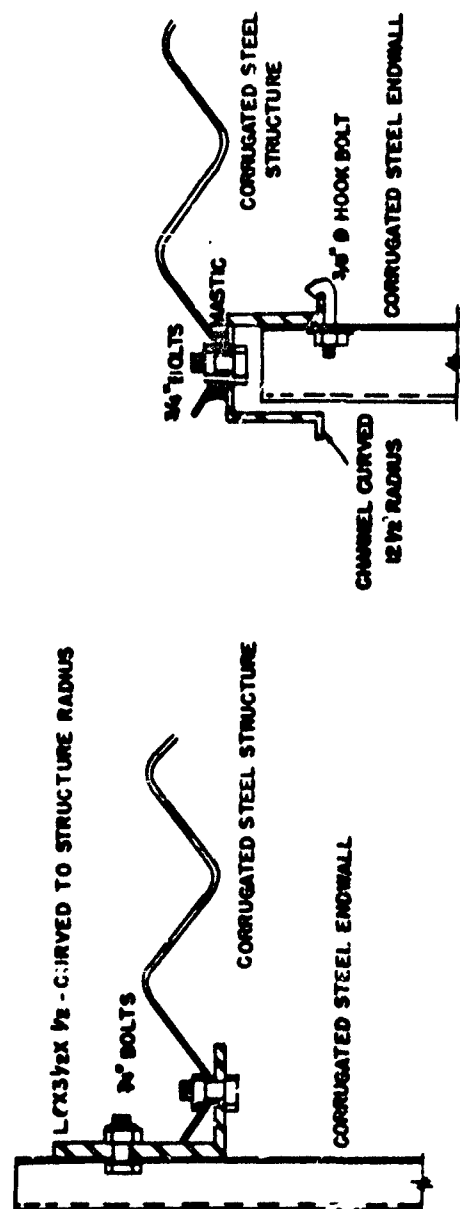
(b). Structure and headman-supported end wall, structures up to 12½-foot radius. Stock parts for Navy stock 12½-foot radius ammunition storage magazine; stock and alternate structure, end wall connection details.
